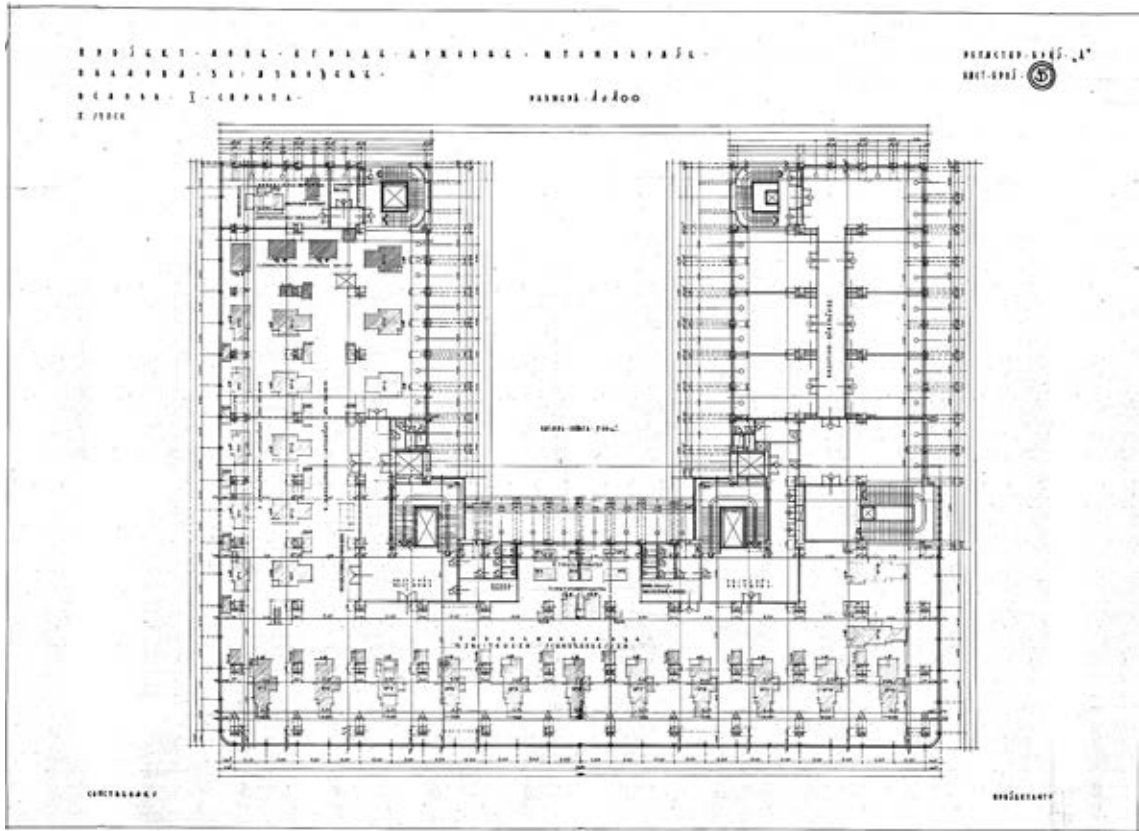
Dragiša Brašovan, *State Printing House* in Belgrade, 1st floor plan (Archive of Yugoslavia, Belgrade)
